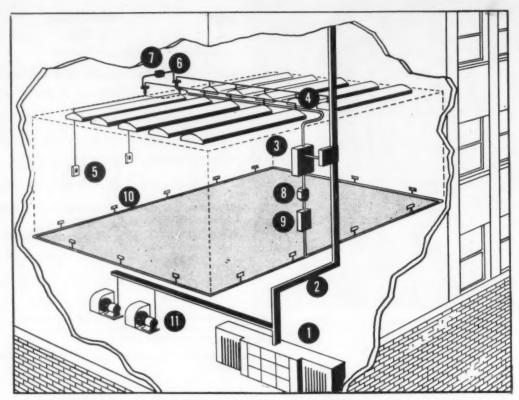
CUTAWAY VIEW of modern office building having 480Y/277-volt primary installation shows (1) unit substation or main 480-v switchboard, (2) busway riser, (3) fusible plugs for panelboard connection at separate floor, (4) lighting circuits at 277-v line-to-neutral, (5) wall switches that control lighting circuits through 24-volt relay (6) and transformer (7), dry-type single-phase transformer (8) serving 120-v panelboard (9) and floor circuits (10), plus several 480-v line-to-line-connected motors (11) for general building services.
